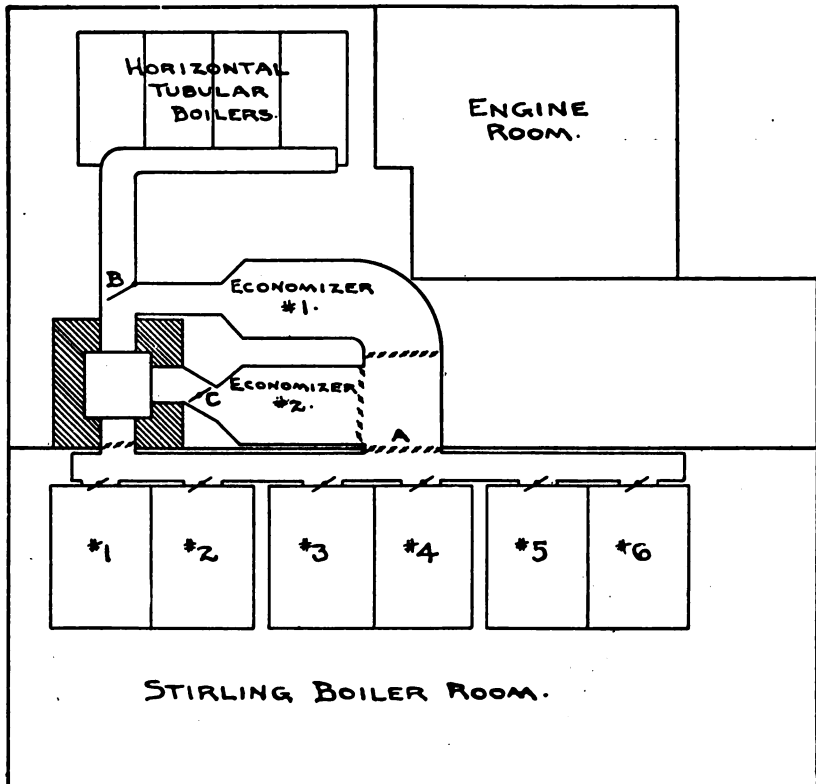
PLAN SHOWING ARRANGEMENT OF BOILERS AND ECONOMIZERS.
